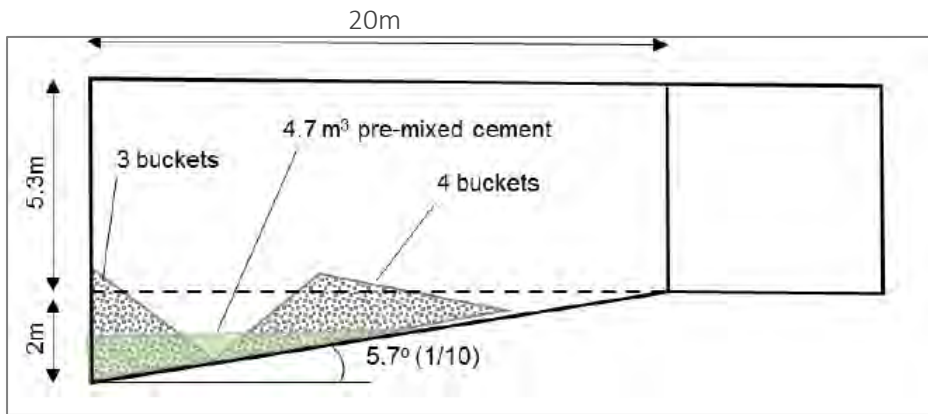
| LONG SECTION OF A MIXING BAY SYSTEM FOR 5% CEMENT (SAINSBURY & SAINSBURY, 2014)
